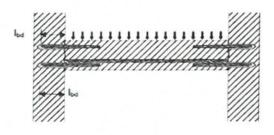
End anchoring of slabs or beams, designed as simply supported
